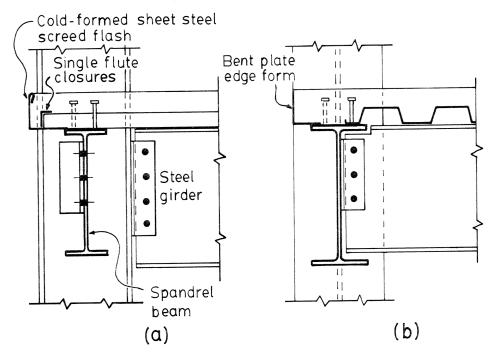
Spandrel Edge Details Showing 'Screed Flash' and 'Edge Form' Angles
